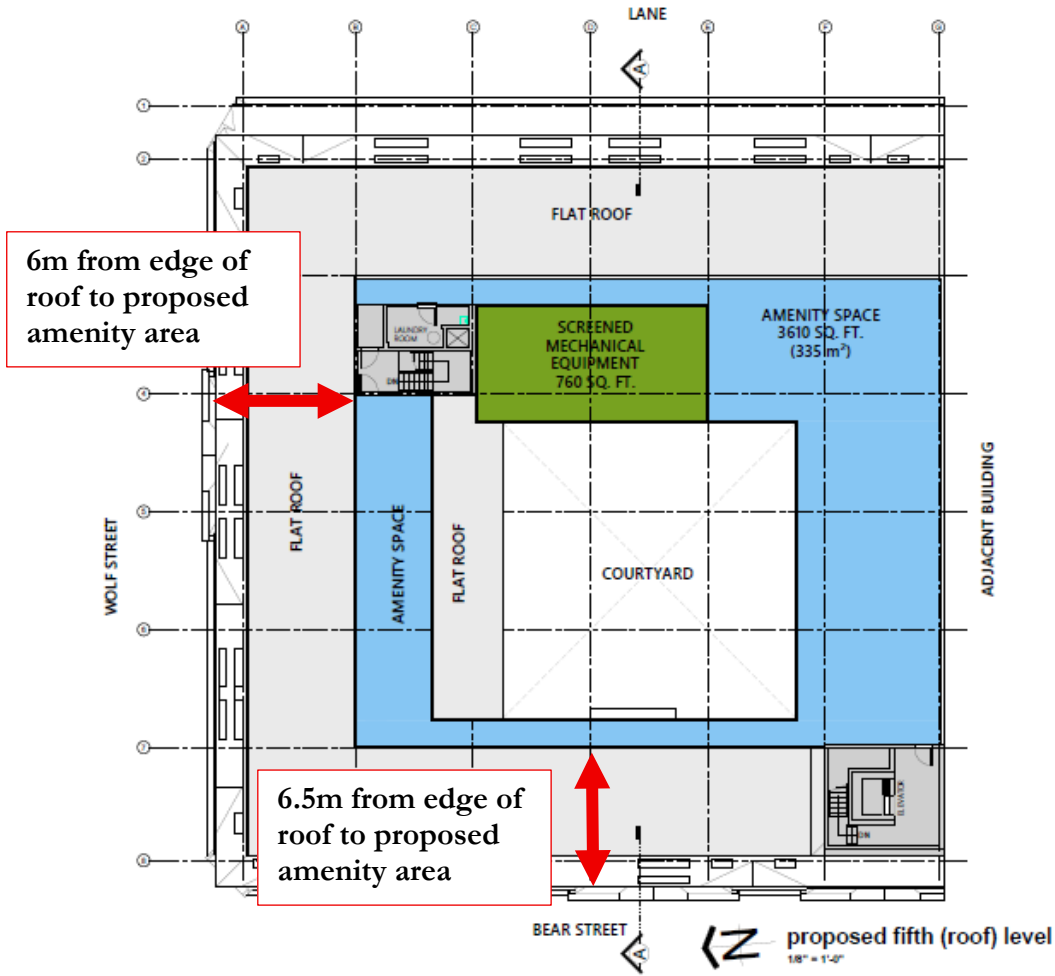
Roof top outdoor amenity area setback from the public sight lines.
